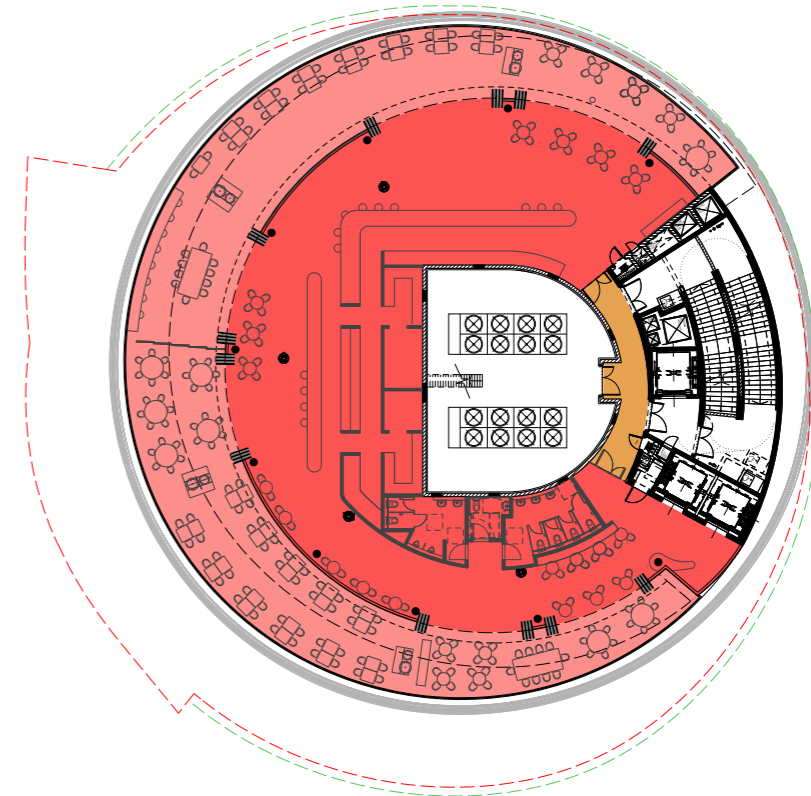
Proposed Level 5 Bar/Restaurant plan (with indicative fit out)
